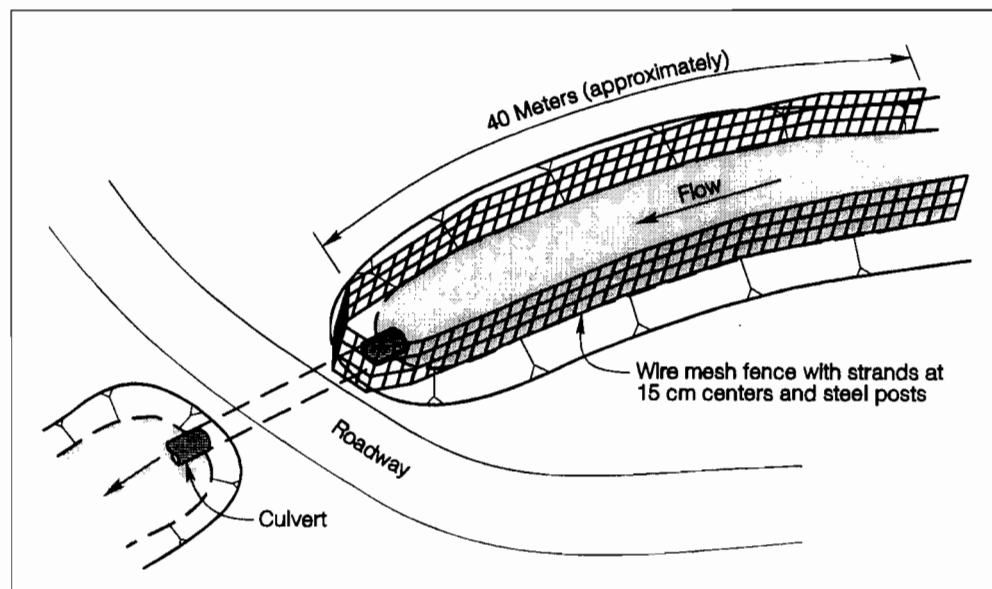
The U-shaped fence restricts access by beavers to the upstream end of the road culvert.
